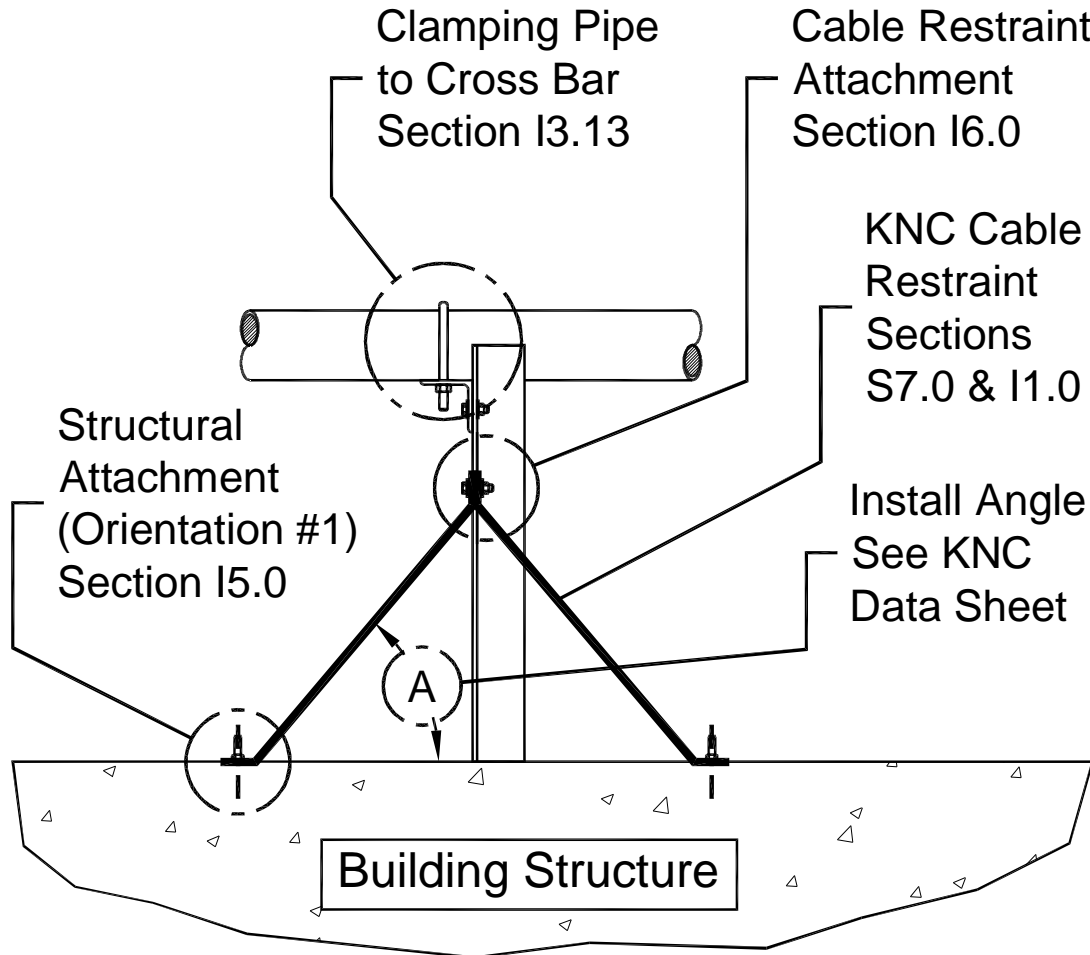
; Longitudinal (L) Cable Restraint Schematic Arrangement for Floor or Roof Mounted Pipe – Restraints Attached to the Floor Stand or Support
